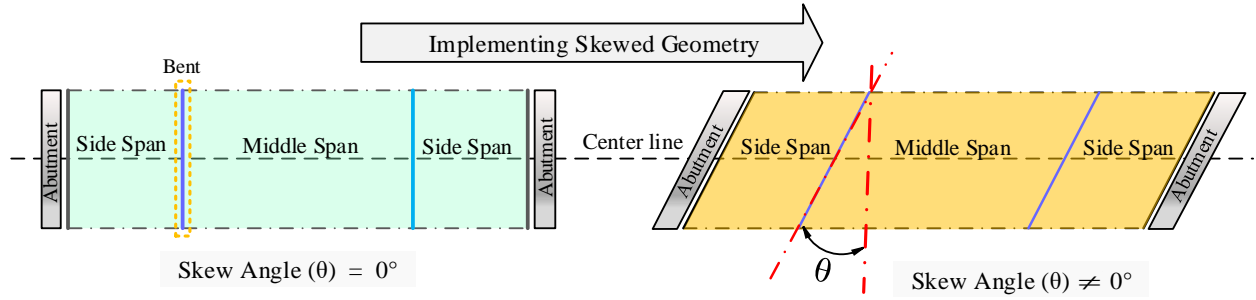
Geometric configuration of the straight/skewed concrete I-girder bridge system
